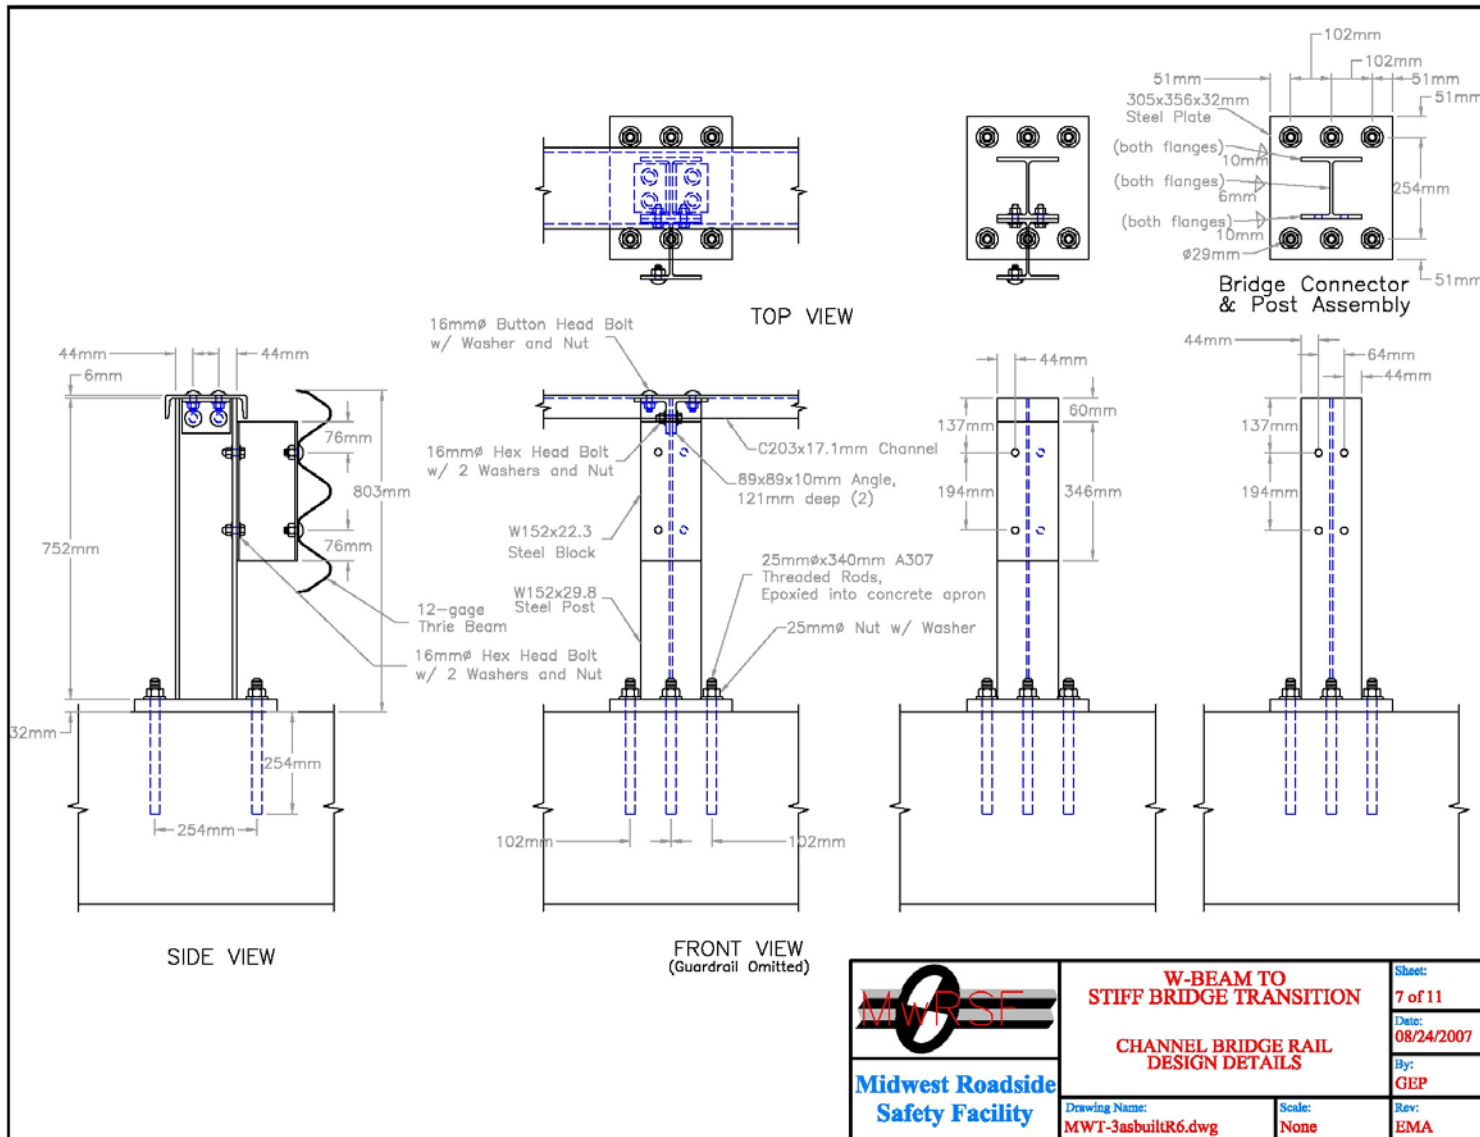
Channel Bridge Rail Design Details (Design No. 1)
